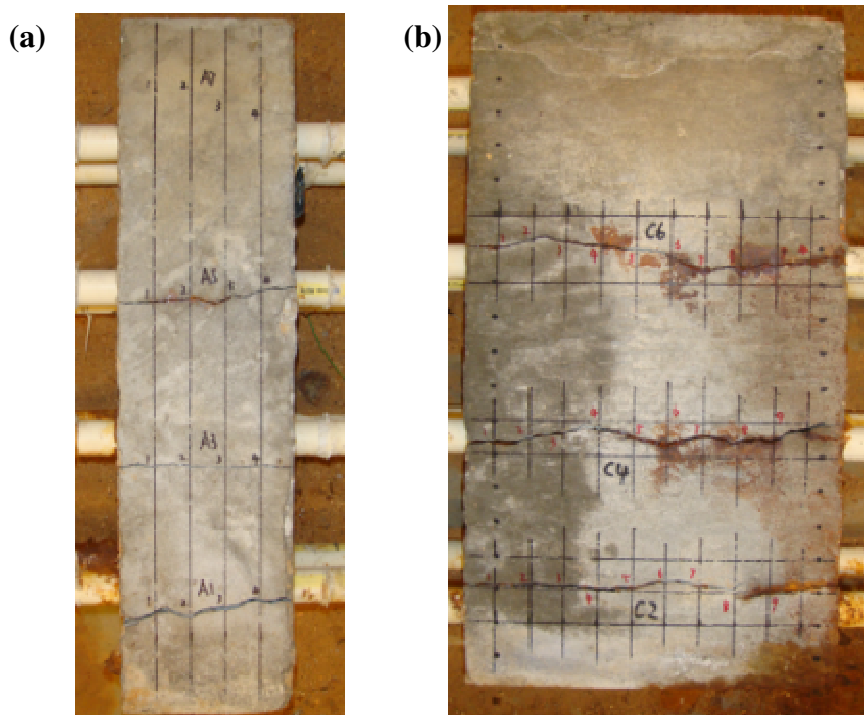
Cracks on the side of: (a) small concrete blocks, and (b) large concrete blocks after corrosion tests.
